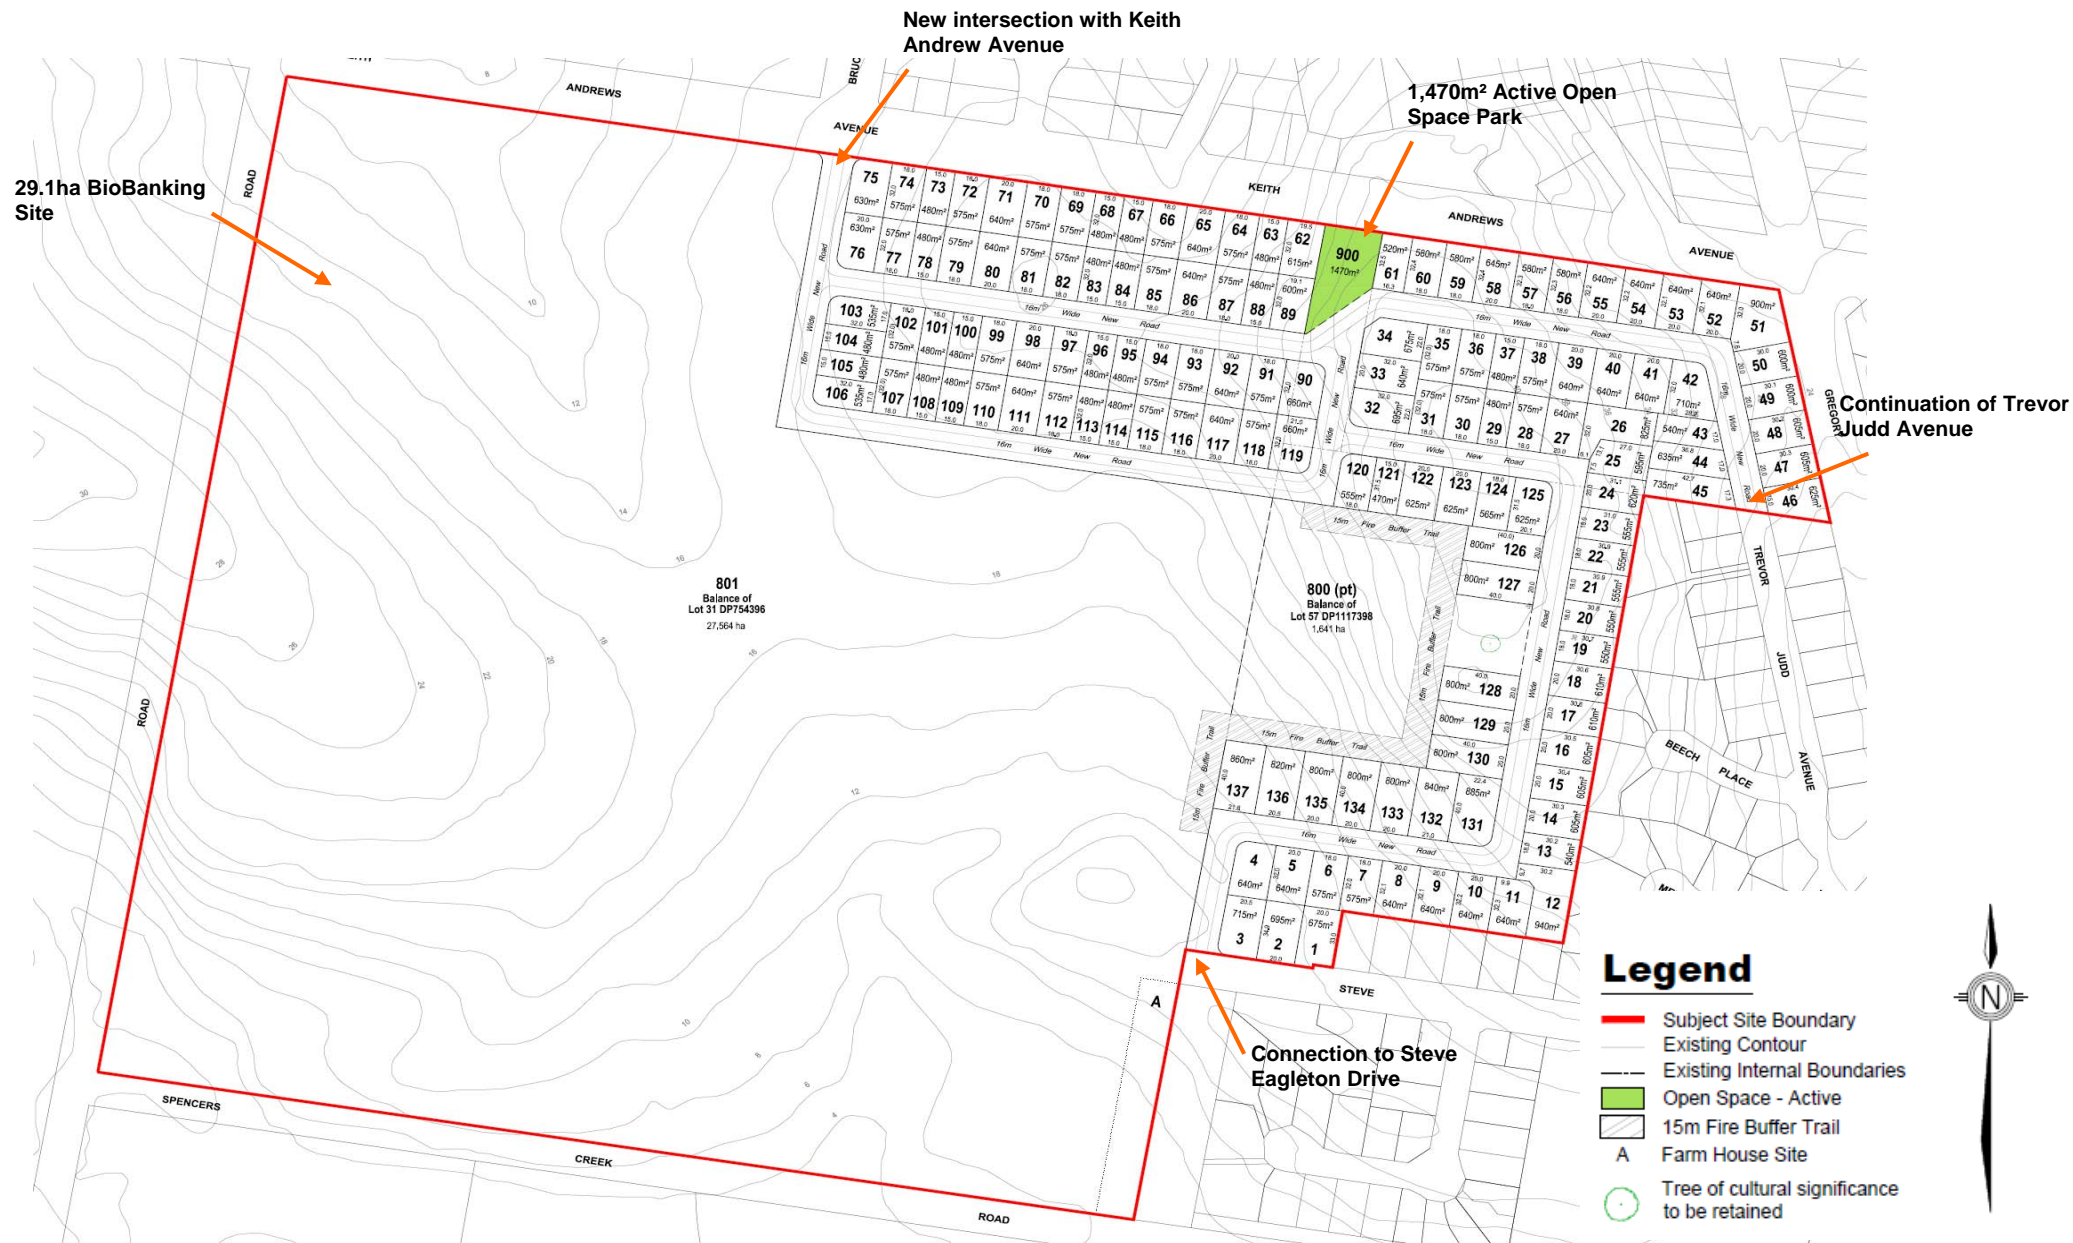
Proposed Concept Design – Settlers Ridge Residential Subdivision – Steve Eagleton Drive, South West Rocks (Preferred Project Report)
